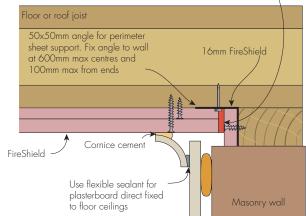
Fire Rated Ceiling to Masonry Wall Direct fixed to joist
